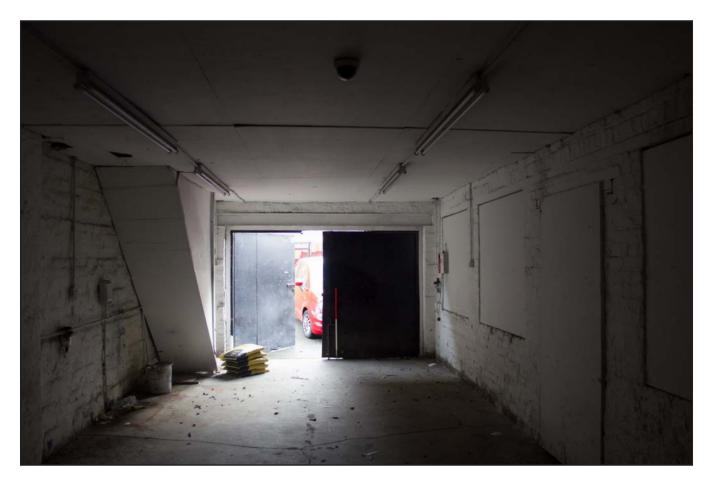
Ground floor workshop, from the northwest. Scale 1.0m.
